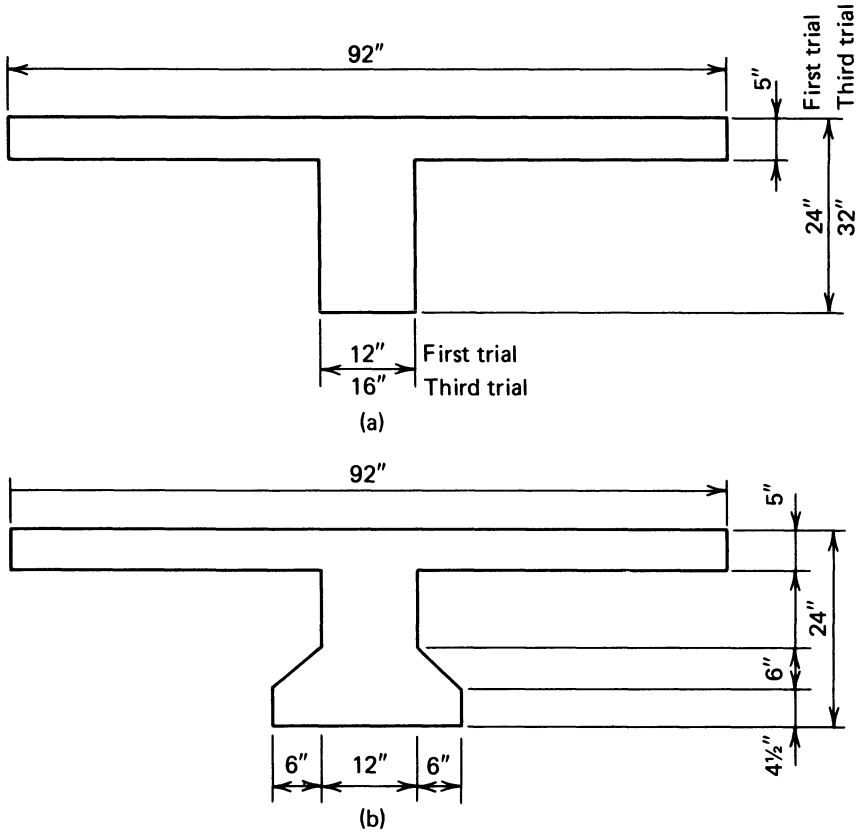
Beam cross sections used in I.P. 9-13.
